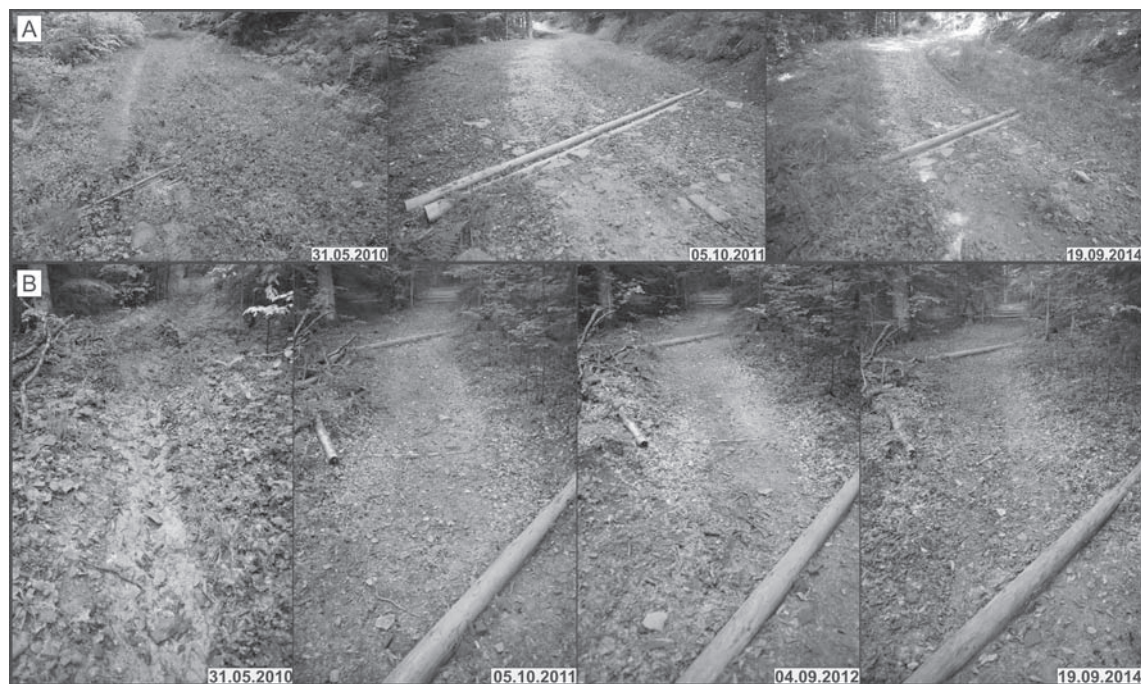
A – pipe culvert before and after trail's rehabilitation. Log leadoff ditch and strengthening of outlet is visible; B – inlet collector protecting the culvert from clogging. Site DGP20, educational trail 'Dolina Gorcowego Potoku'.
